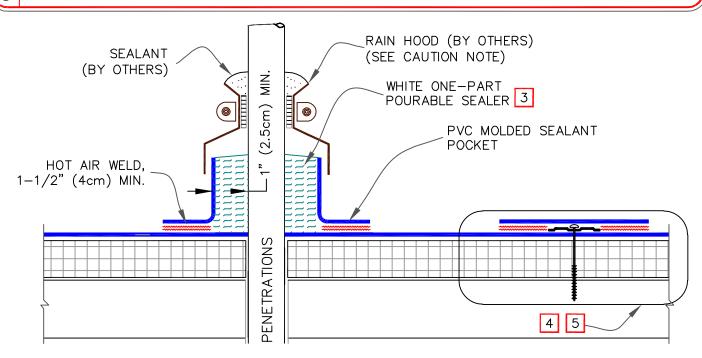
DETAIL NOT FOR USE ON 25 OR 30-YEAR WARRANTY PROJECTS, PRE-FABRICATED/PRE-MOLDED ACCESSORIES MUST BE UTILIZED. ACCEPTABLE FLASHING SHALL CONFORM WITH PVC UNIVERSAL DETAIL <u>U-15D</u> OR <u>U-15G</u>.
